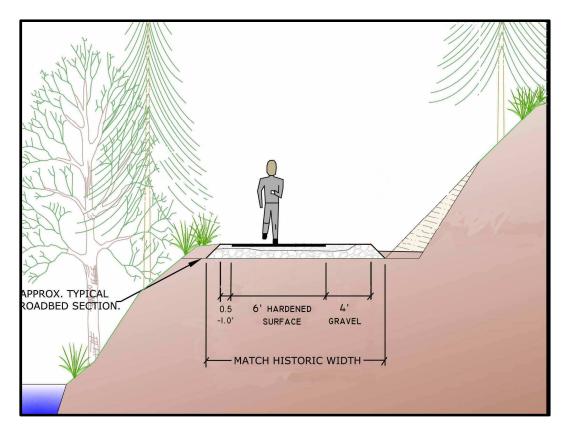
Trail profile (historic railroad sections) for Alternative 3
